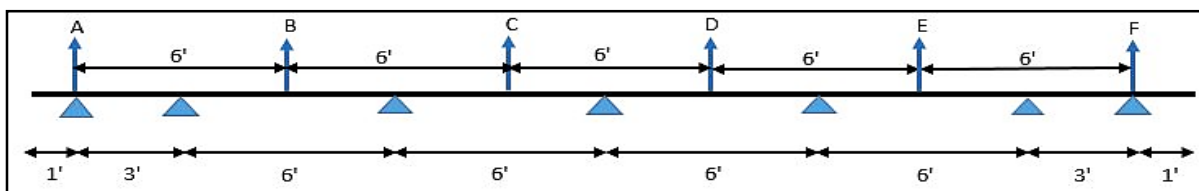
Point load scheme for roof assembly (6' fastener line distance)
